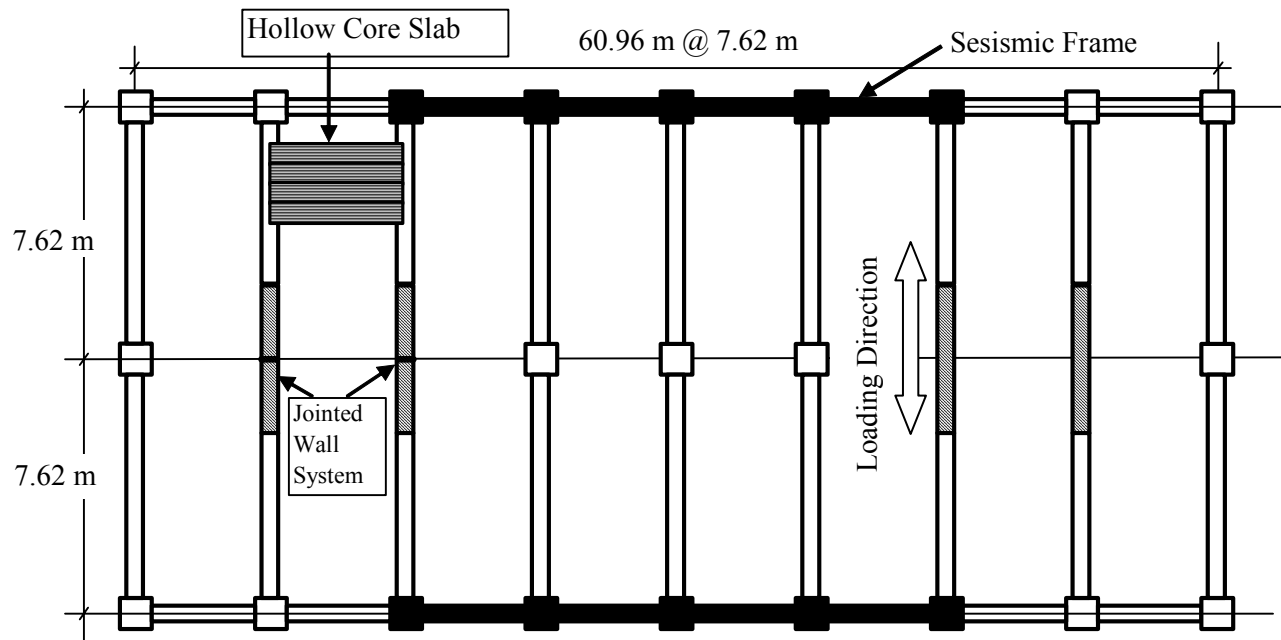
Plan view of the five, seven and ten story prototype buildings
